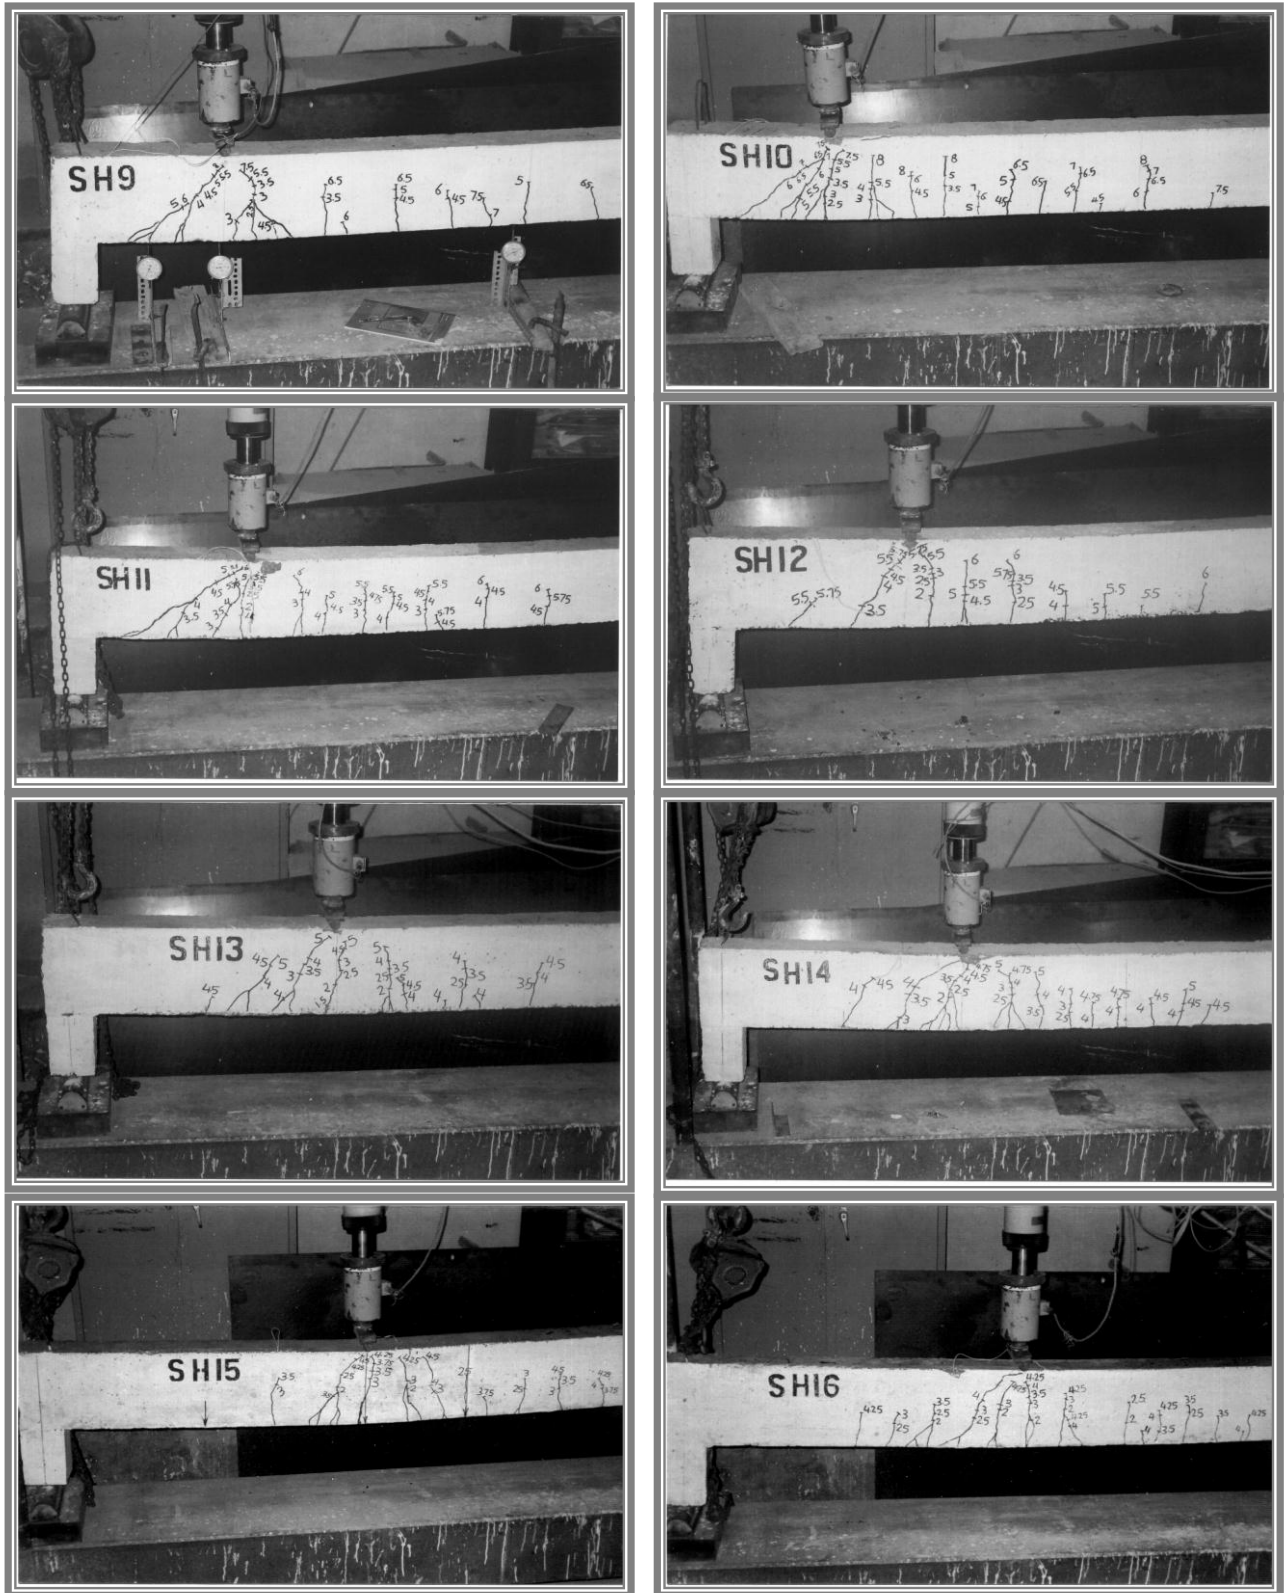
Cracking patterns after failure for tested high strength concrete beams with stirrups in group "H2".
